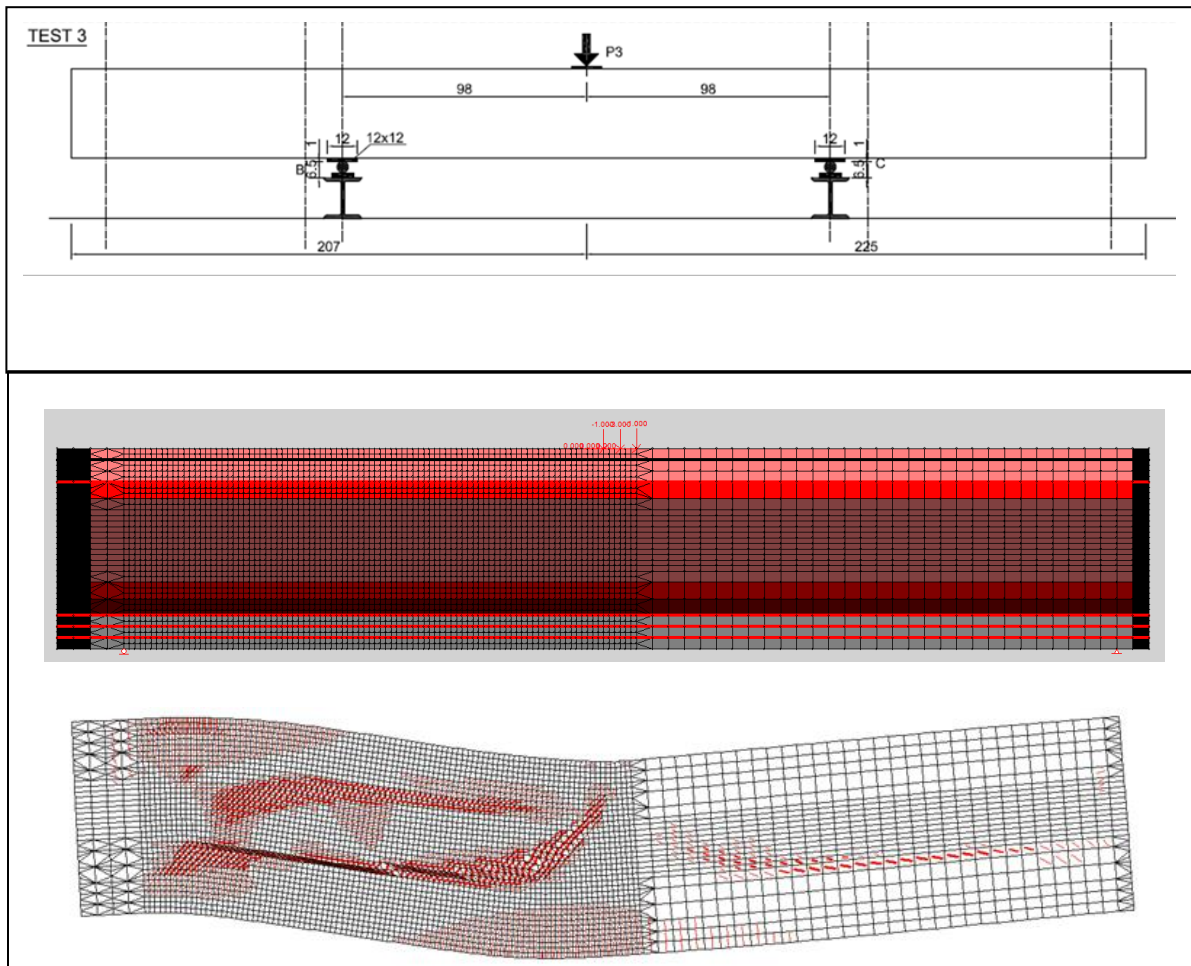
Beam 1 Test 3 Model (dimensions in inches).
